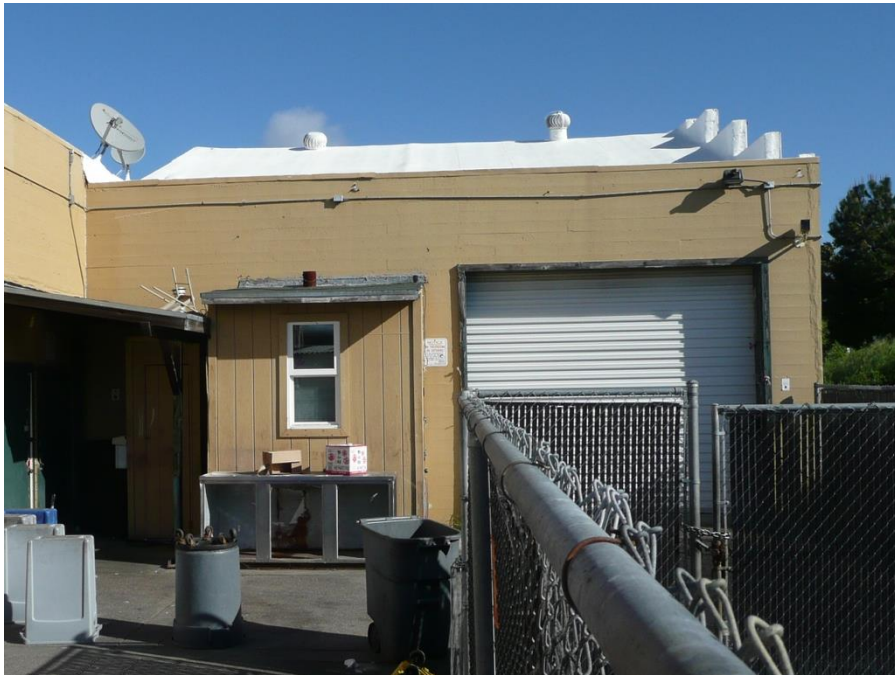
South elevation of the rear wing, facing north, also showing the east elevation of main building form visible at left.
